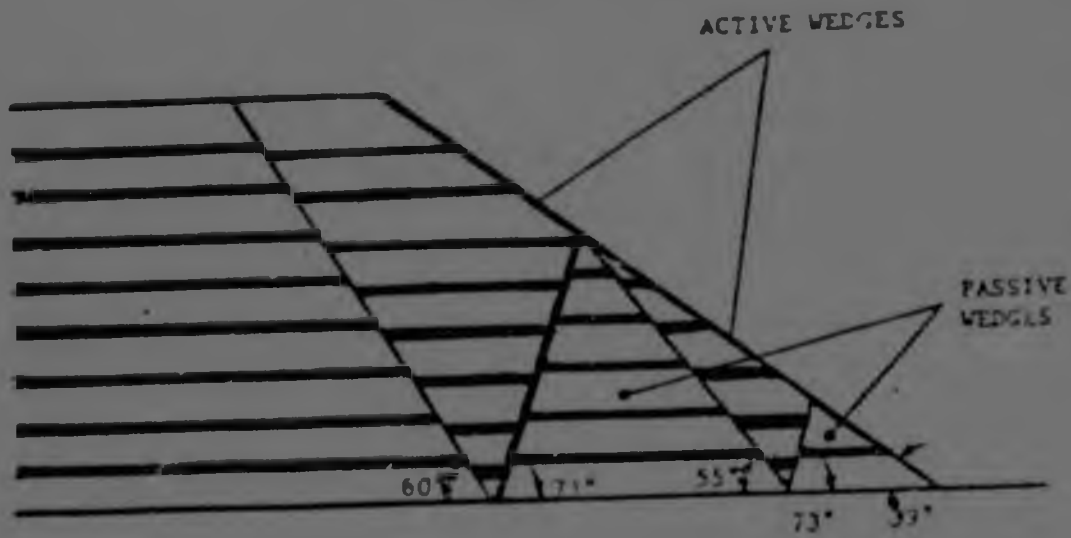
Section through two typical failed rock dumps on thin horizontal clay foundations
